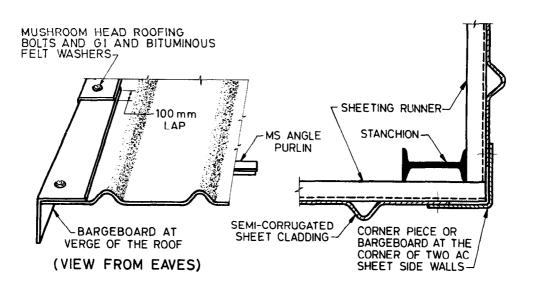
TYPICAL BARGEBORD AND CORNER ROLL
